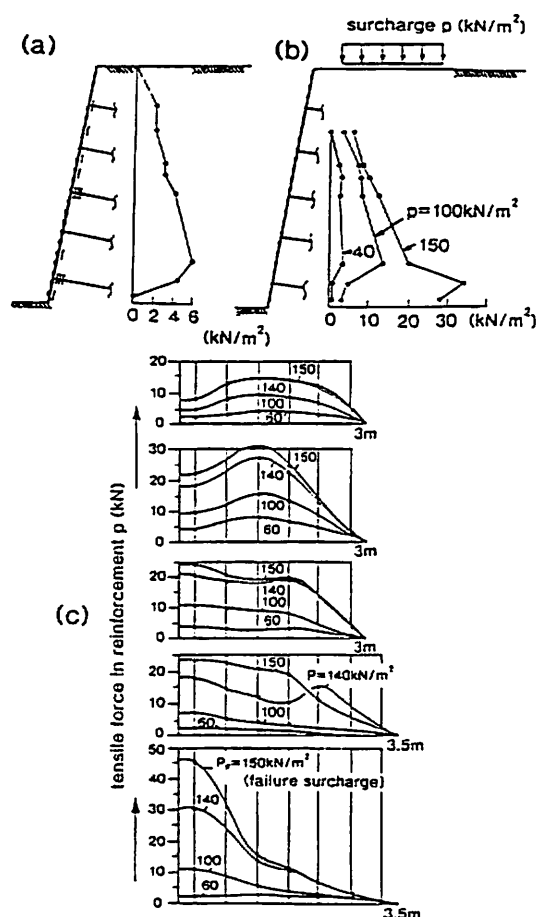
Results of a full-scale test of nailed retaining wall in sand; (a) earth pressure on the back face of the wall due to the dead weight of soil, (b) earth pressure due to the surface load (Gassler and Gudehus, 1981), and (c) the corresponding distribution of tensile force in reinforcement due to the surface load (Stocker et al., 1979).
